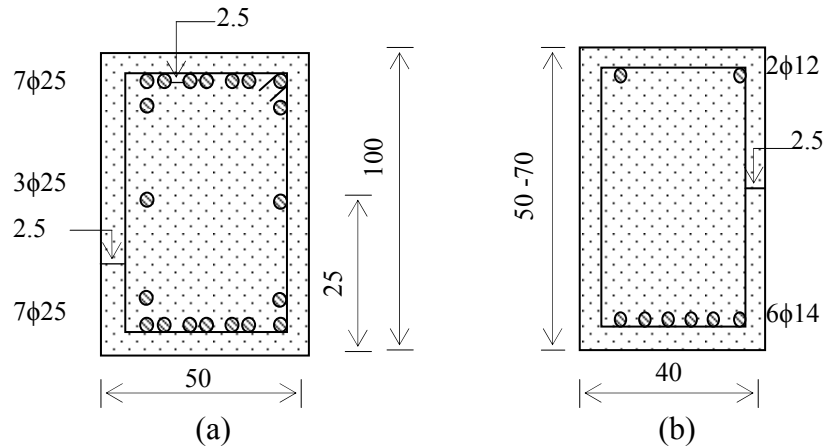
Details of reinforcement bars before corrosion induced (dimensions in cm): (a) columns, (b) beams.
